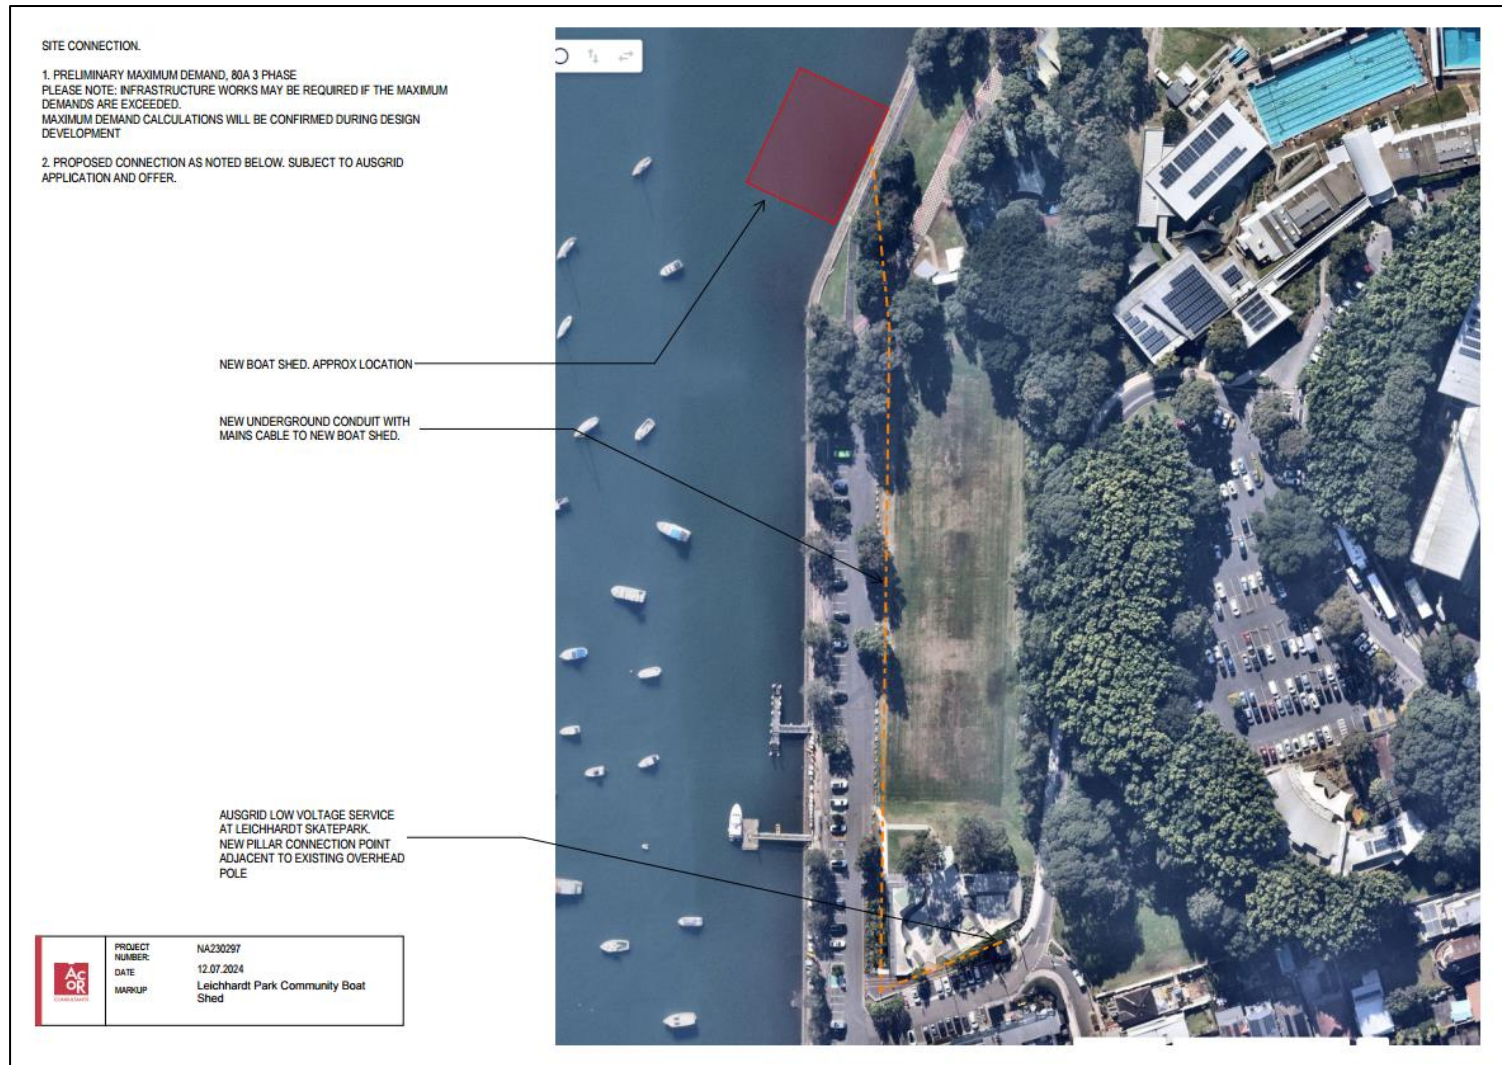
Proposed Electrical connection provided by email by Client 13/2/2025
